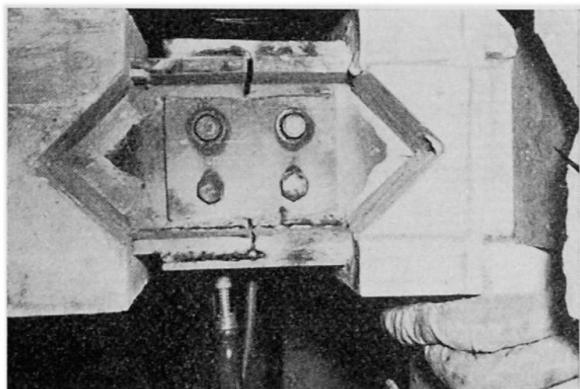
A joint made by using two extended I-beams locked and welded together.
